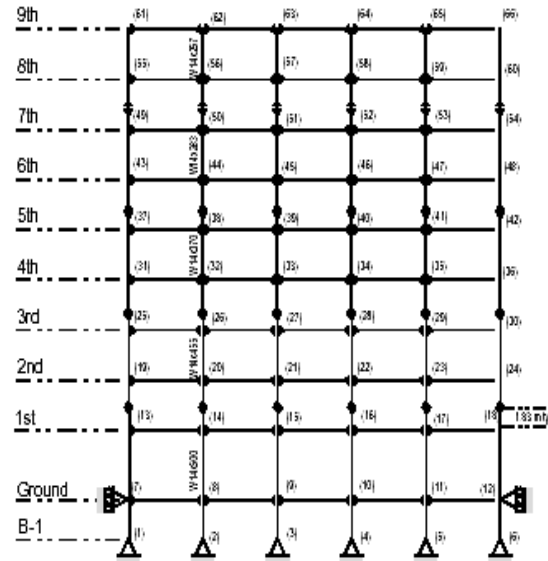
Considered benchmark structure, 9 levels – NS Frame
